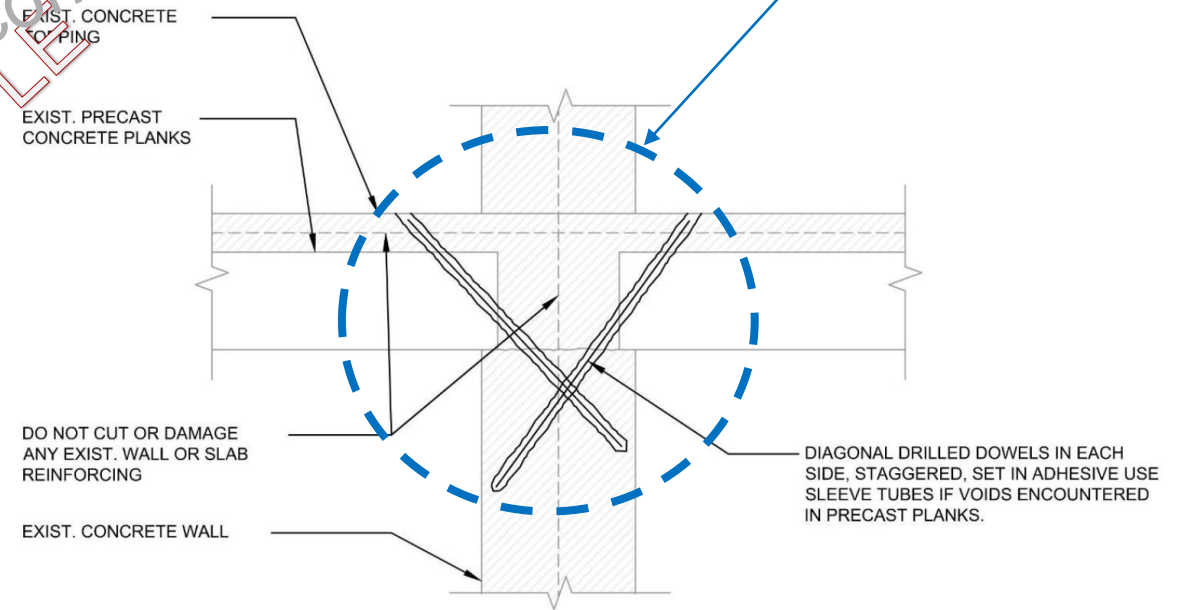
Diagonal dowels added at precast slab-wall joint
